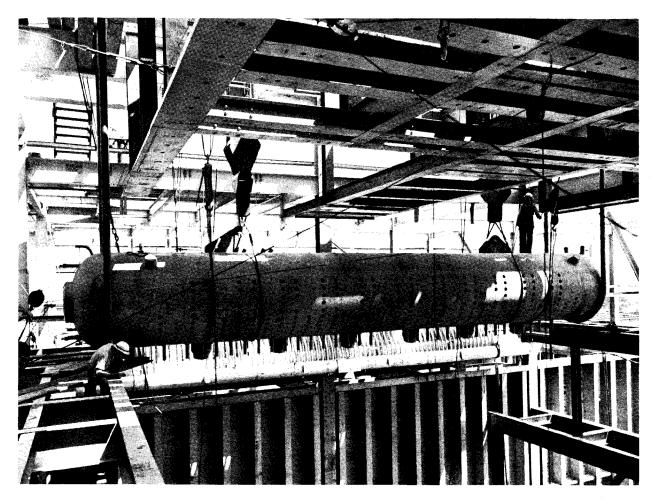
Raising boiler drum for unit 3, weight 229,000 pounds, using 2 pair of 140-ton 8-sheave load blocks. The drum is 66-inch id by 47 feet 11 inches long.
